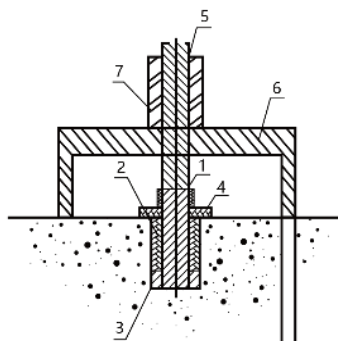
Schematic Diagram of Post-anchorage Pull-out Structure
